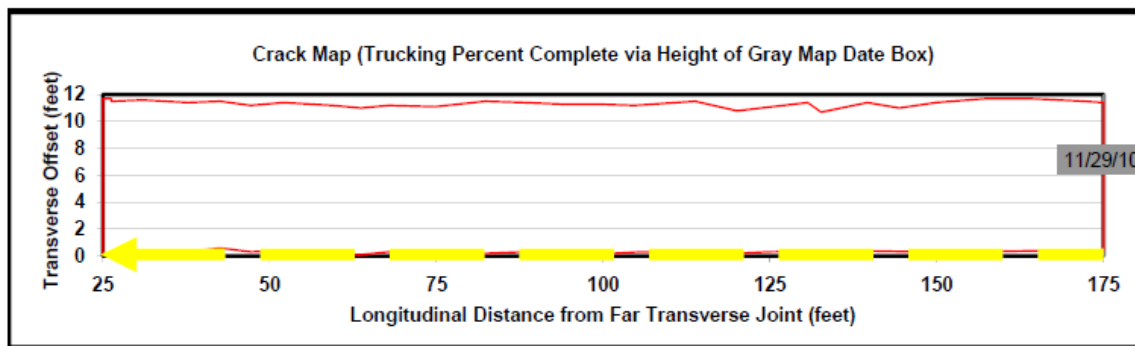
Crack Mapping at the NCAT Test Track - Test Section N1
